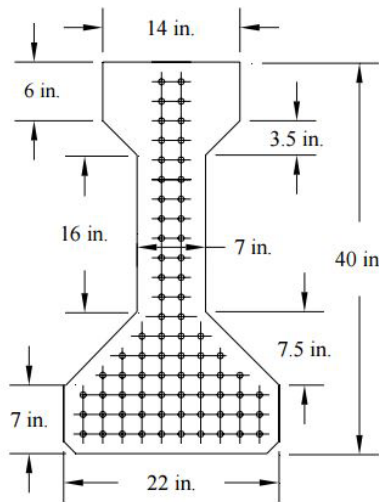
Section Geometry of Type C girder (TxDOT 2001)
